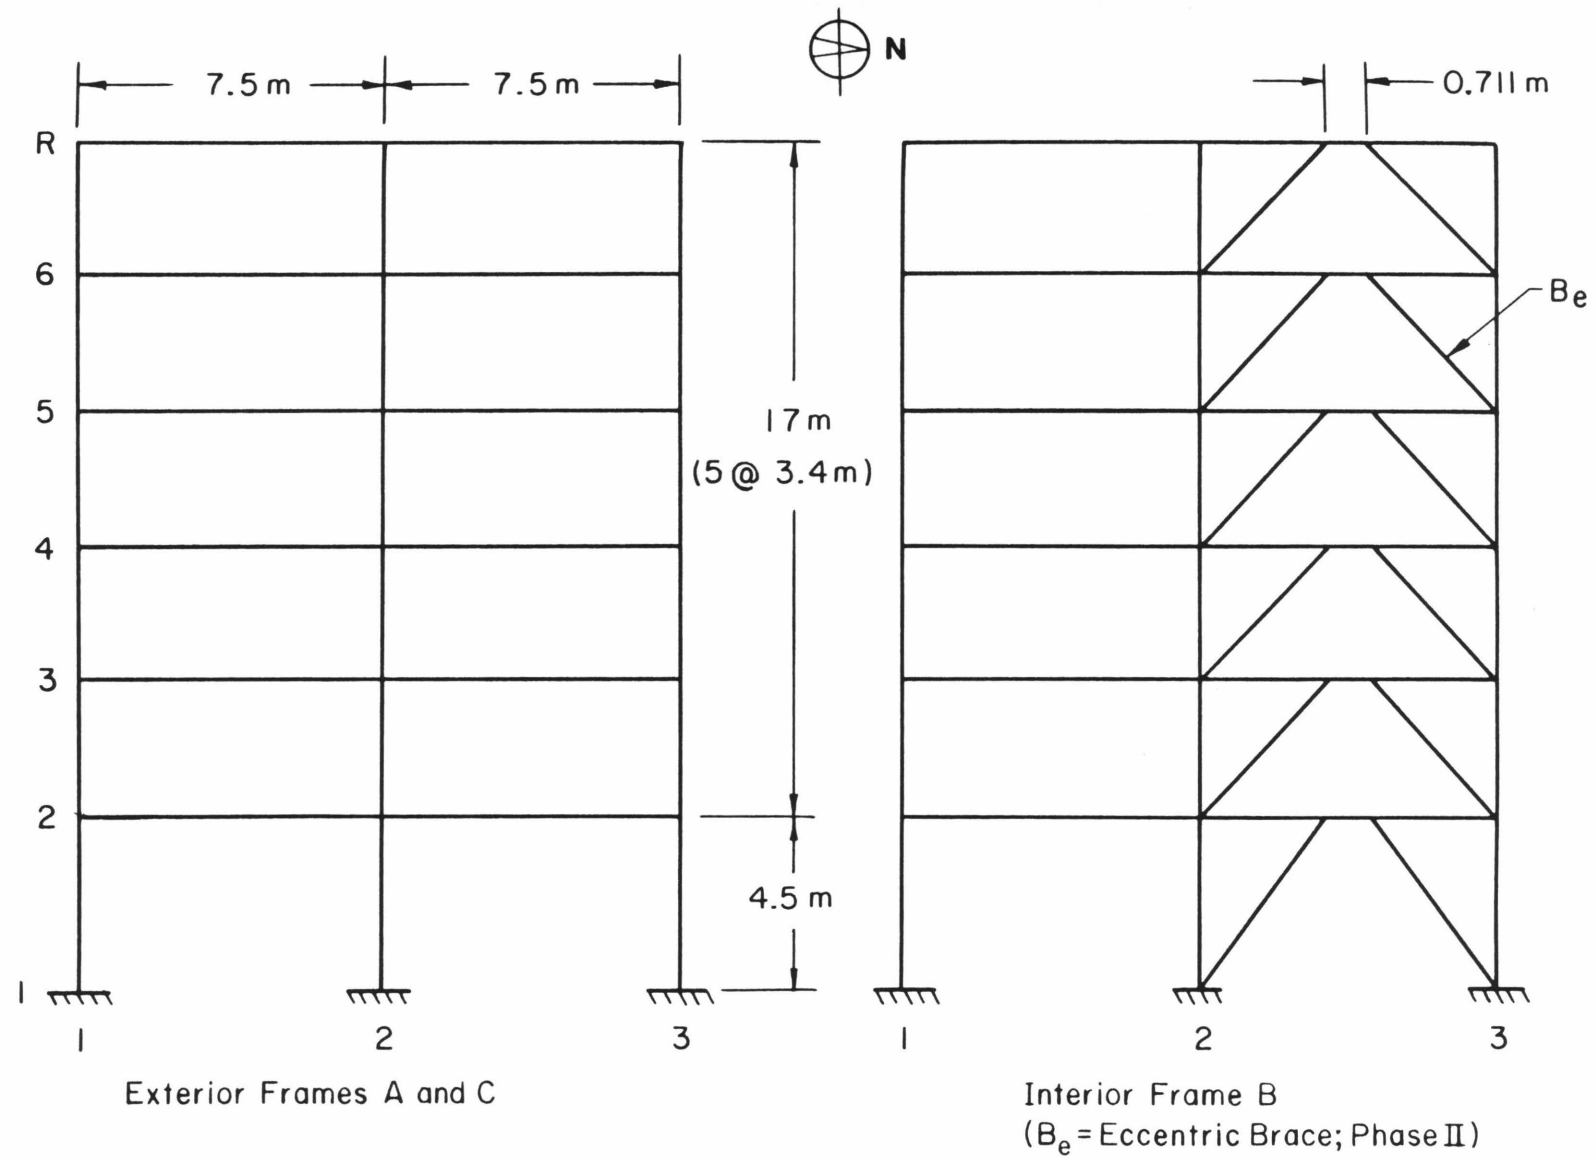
Elevation Views of Exterior and Interior Frames of Test Structure [25]
